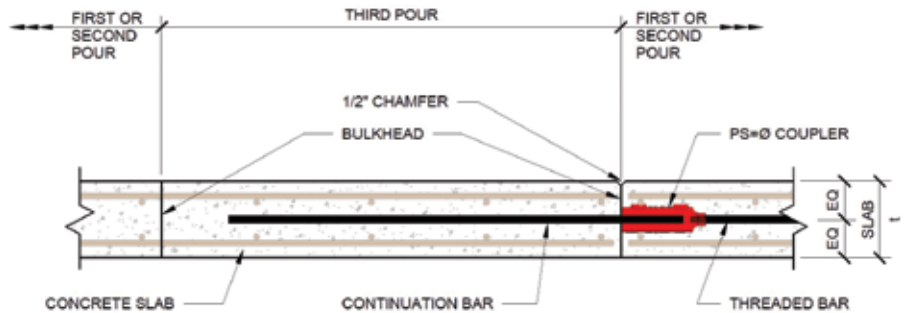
Typical PS=Ø slab-to-slab restraint relief joint with a temporary stressing strip
